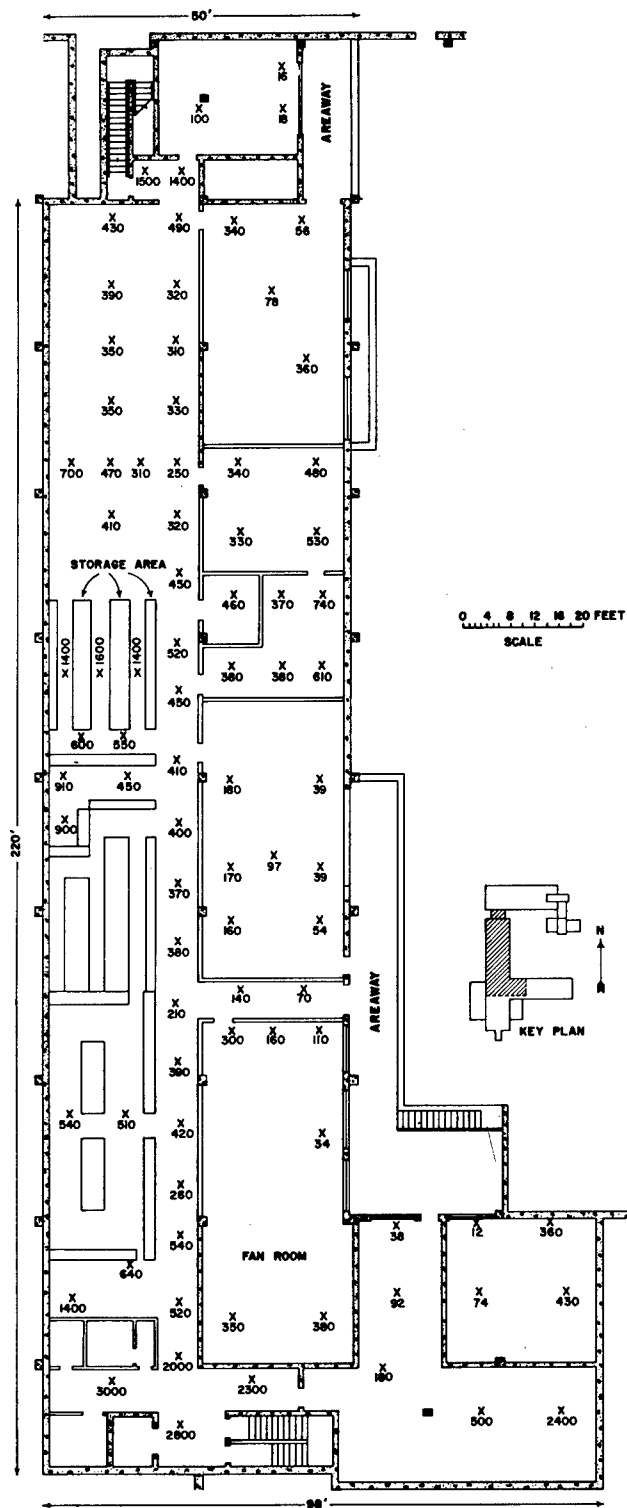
Protection factors plotted on basement floor plan of UCLA structure.
